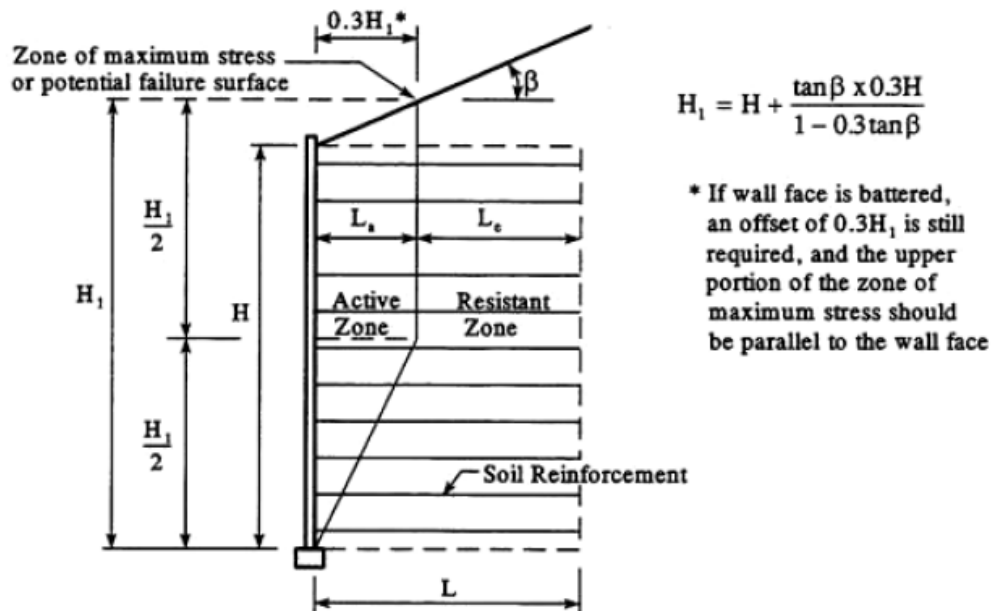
Location of potential failure surface for MSE wall with inextensible reinforcement (Berg et al. 2009).
